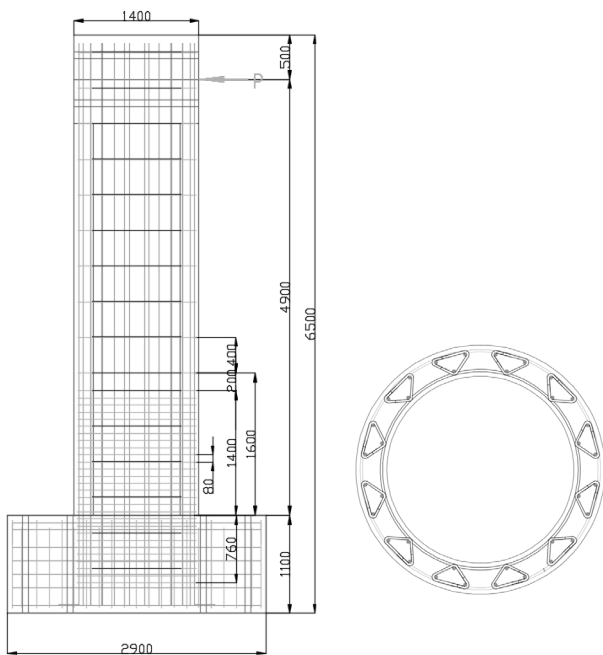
Hollow cast-in-place bridge column (Unit: mm)³⁾
